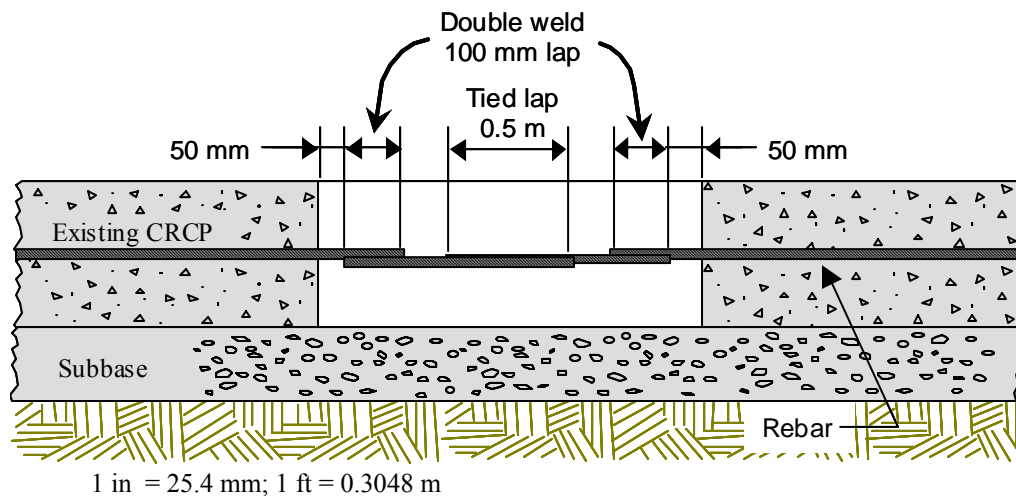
Details of welded or mechanical connection for CRCP repair (FHWA 1985).
